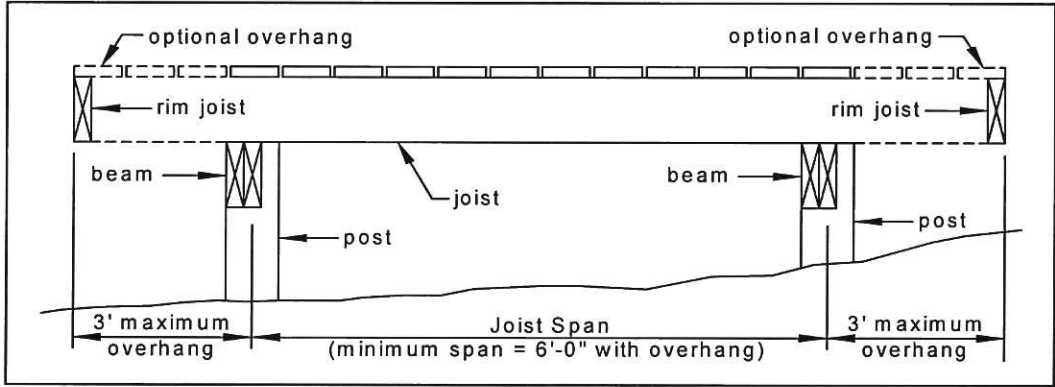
JOIST SPAN - FREE-STANDING DECK
